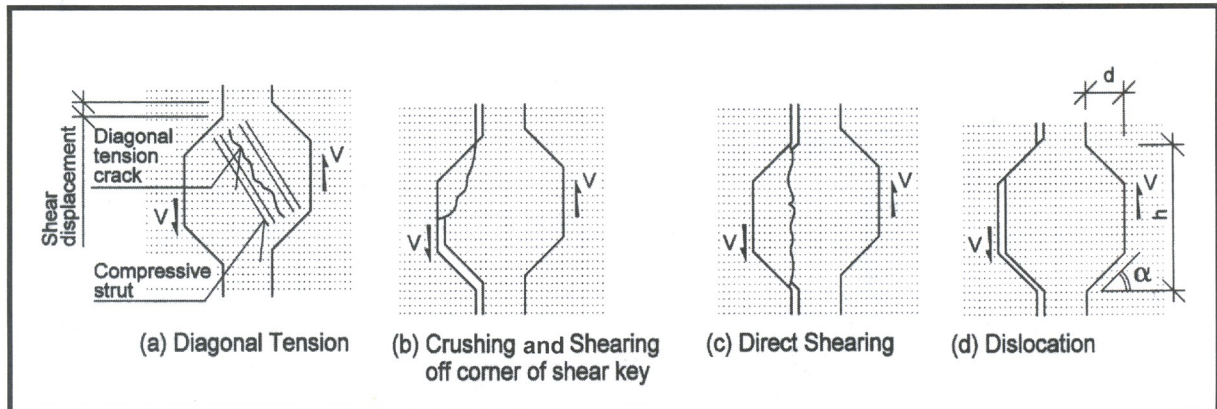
Failure Modes Of Joint Concrete In Shear Key
